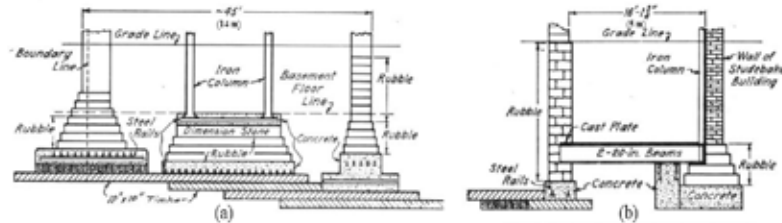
Auditorium Building, section through combined footings (a) and cantilever footing (b) (Peck, 1948).
